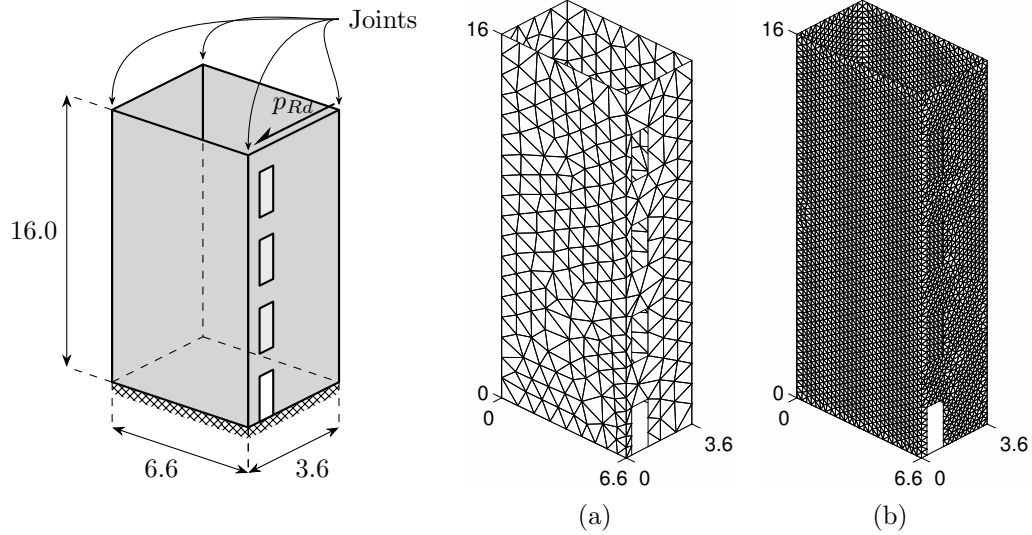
Precast concrete stairwell subjected to shear and torsion: a) Sketch of the structure with loading and positions of the joints, b) coarse mesh with 864 plane stress elements, c) fine mesh with 11,379 plane stress elements. All dimensions are given in metres.
